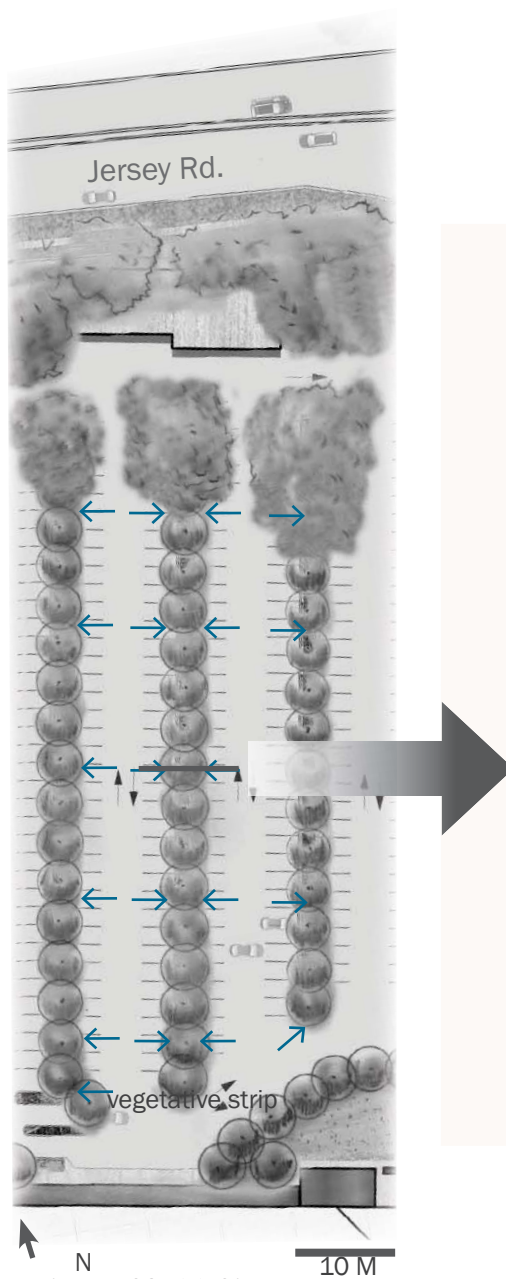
(a) Site Plan - vegetative strip between parking rows.
